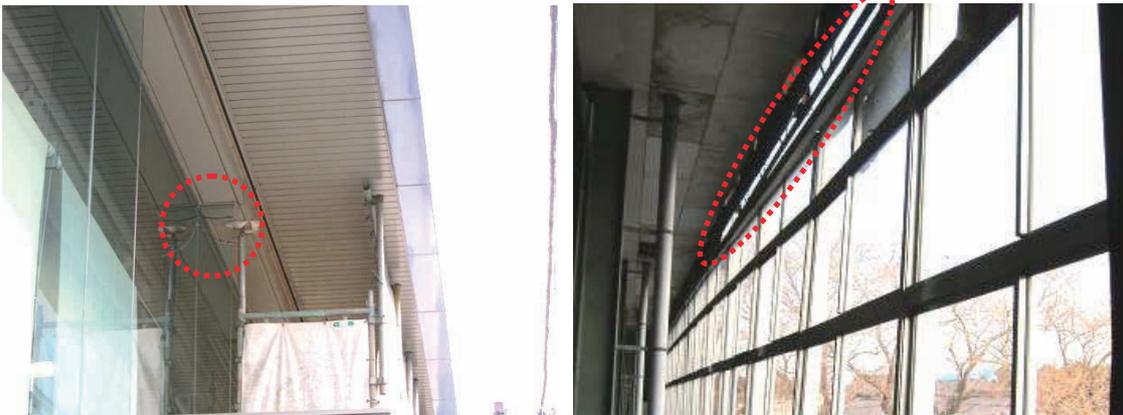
Breakage of glass mullion of glass wall system Photo 6.6-13 Dislocation of window frame
